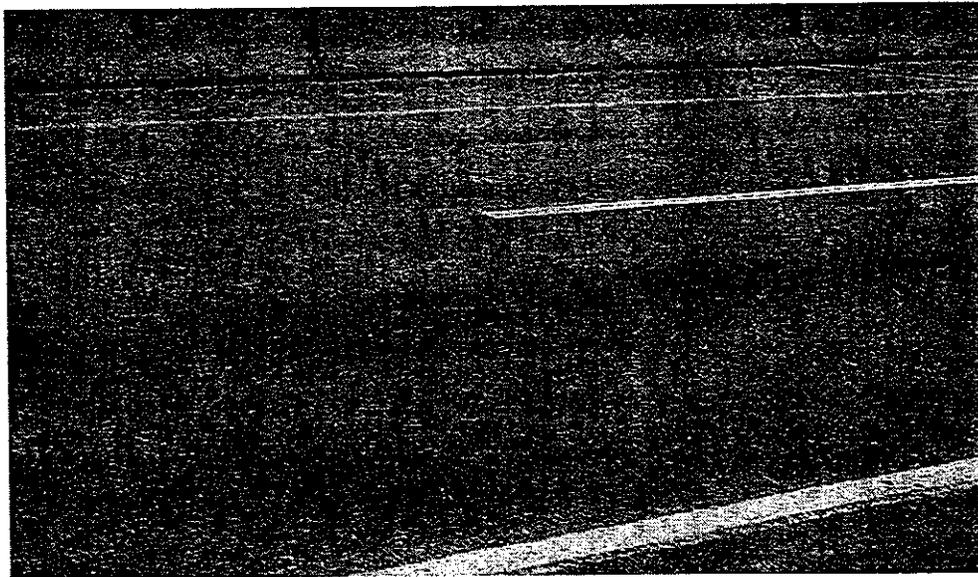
PROJECT 3B - CP BRIDGE DECK: LONGITUDINAL CRACKING IN DECK
